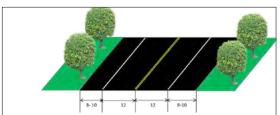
Cape Henlopen Drive: Existing Conditions. Note that Cape Henlopen Drive has two travel lanes for most of its distance but widens to four lanes at the Ferry terminal and widens to provide a separate turning lane at its intersection with Freeman Highway.
